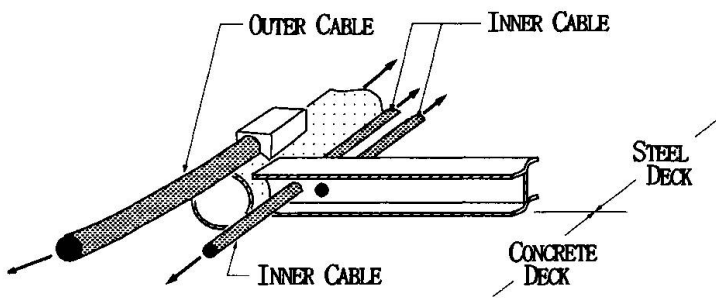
Inner and outer cables at the connection of steel and concrete decks.
